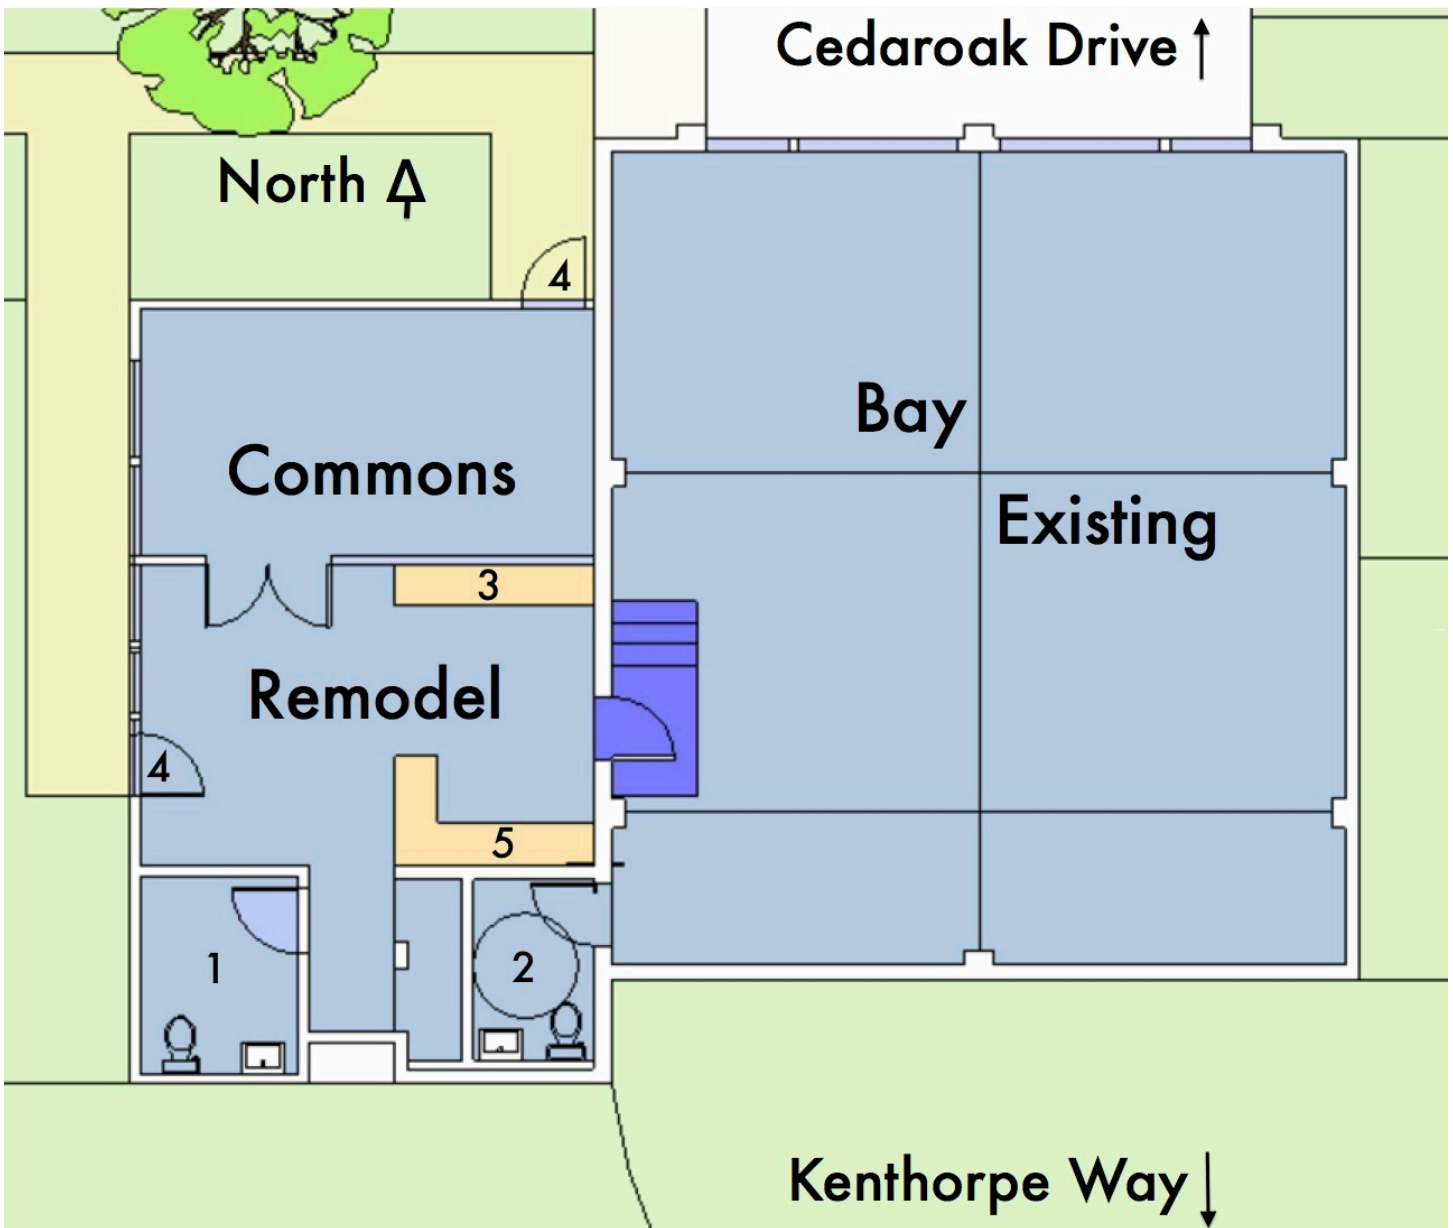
Concept Phase 1 Building 1 remodel floor plan showing:
